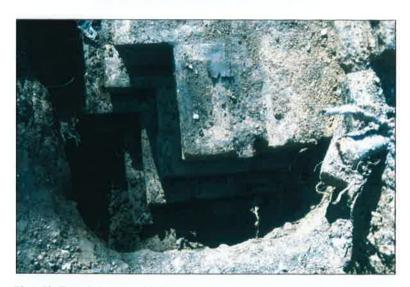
Test pit 1, stepped bricks at the base of the foundation (OA 2004, F13/13)
